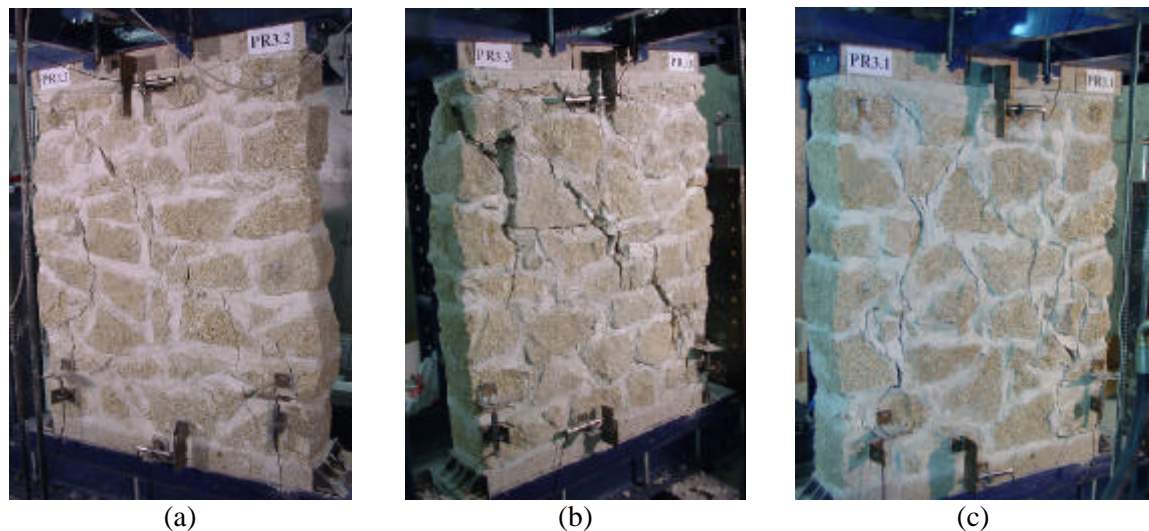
Failure modes of walls WR.250; (a) failure of the wall WR3.250; (b) failure of the wall WR2.250; (c) failure of the wall WR1.250
